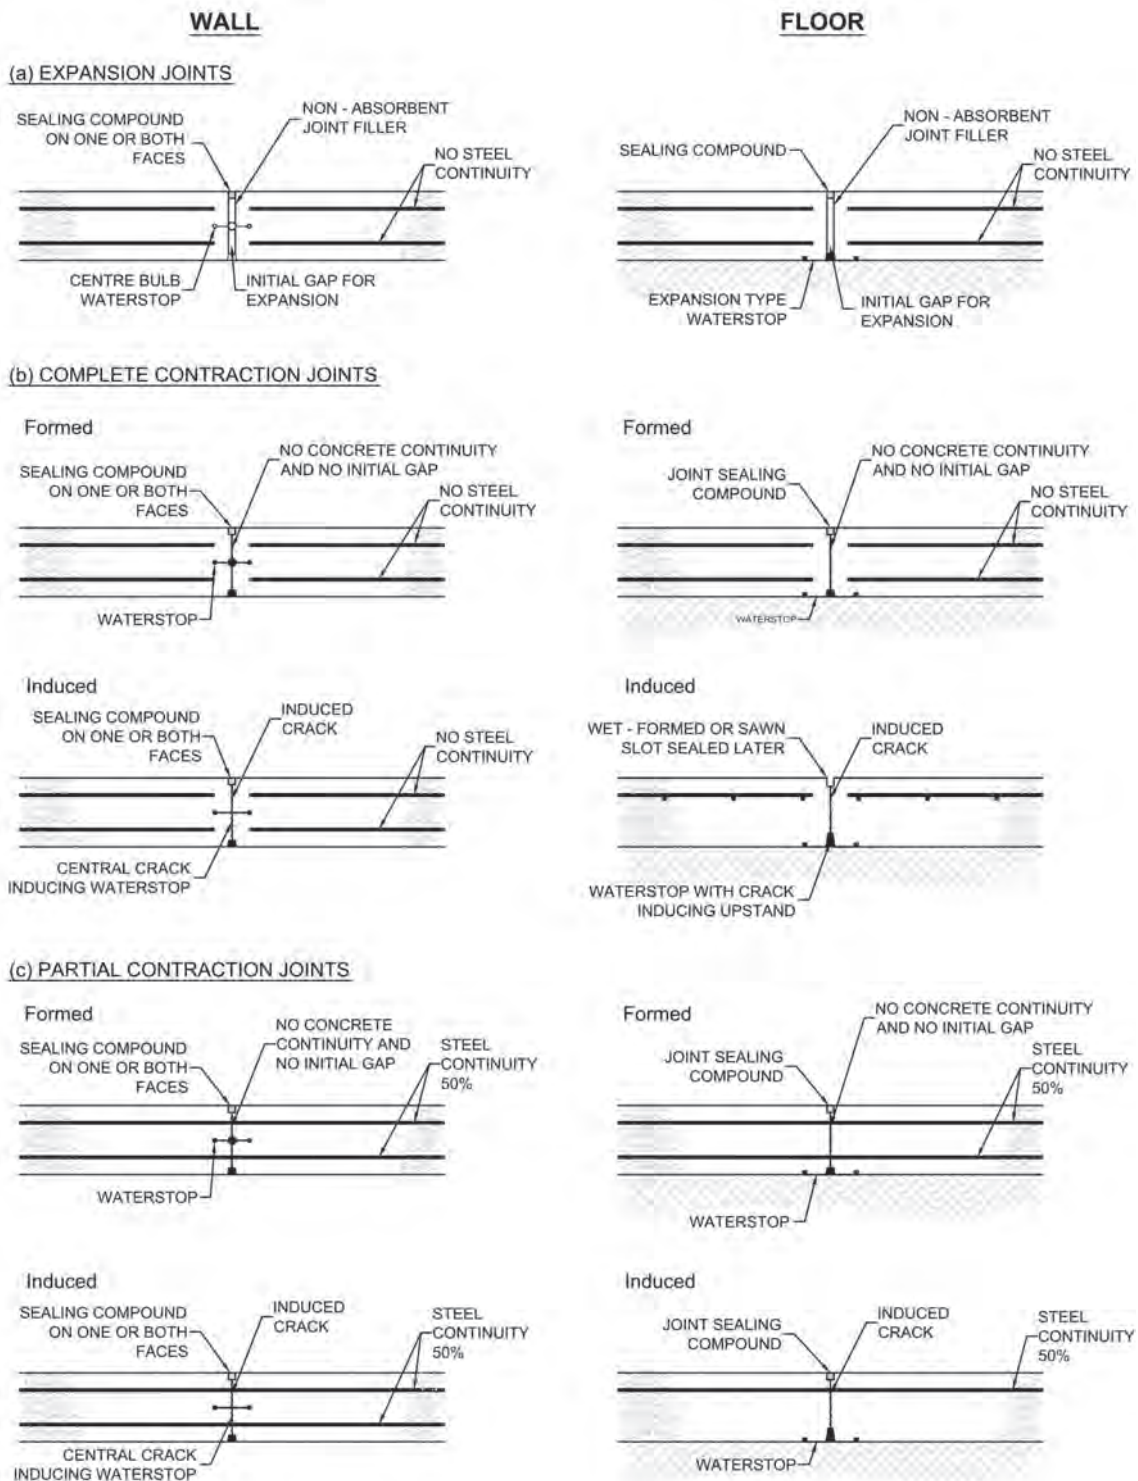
Typical details for expansion and contraction joints for the walls and bases of in situ reinforced concrete walls and bases (from BS 8007:1987)
